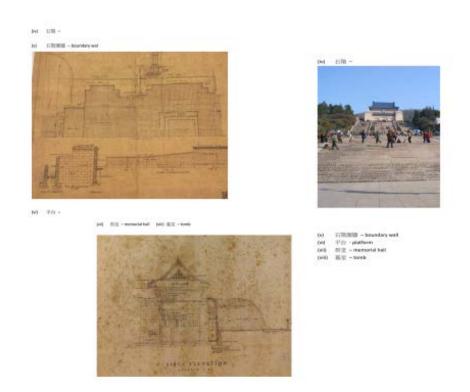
Pavement, Platform, Surrounding Wall and Tomb of the Mausoleum
